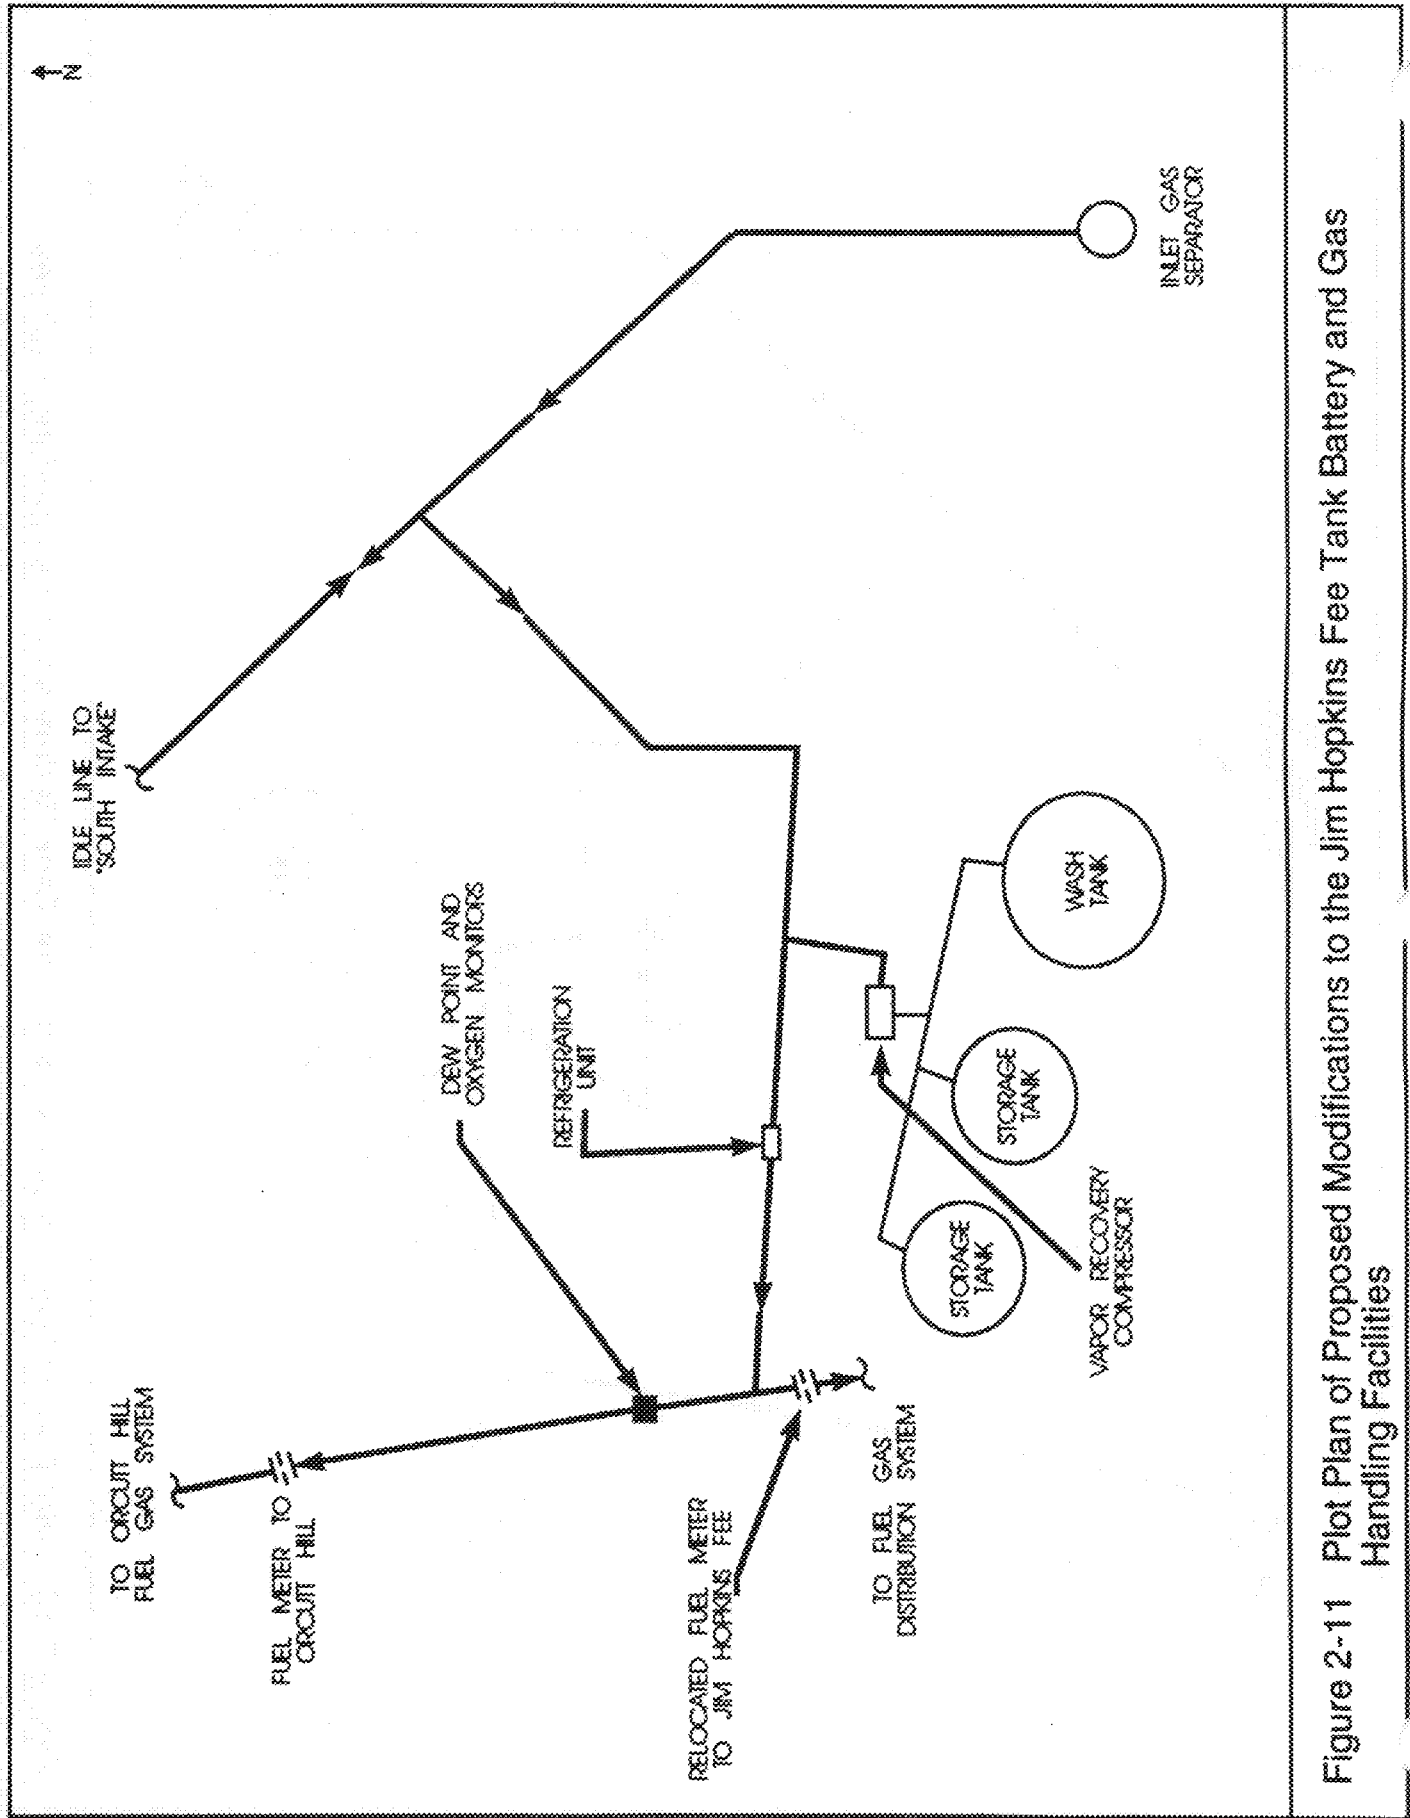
Plot Plan of Proposed Modifications to the Jim Hopkins Fee Tank Battery and Gas Handling Facilities
